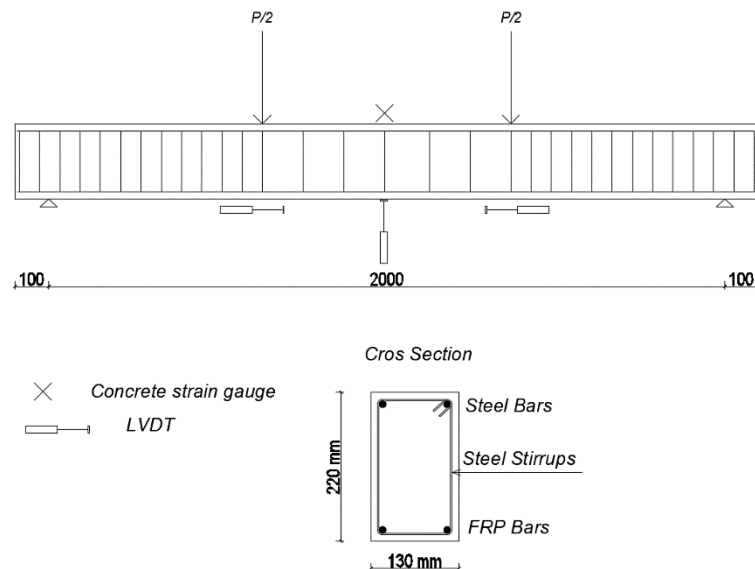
Beam details and instrumentation and geometrical parameters of the concrete beams
